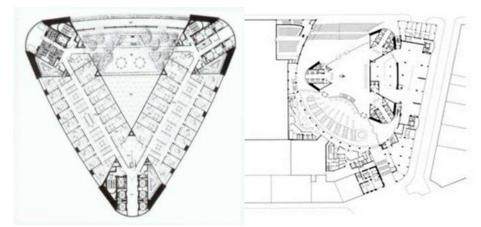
The Frankfurt Commerzbank Headquarter Typical Plan (McCallum, 1997).
